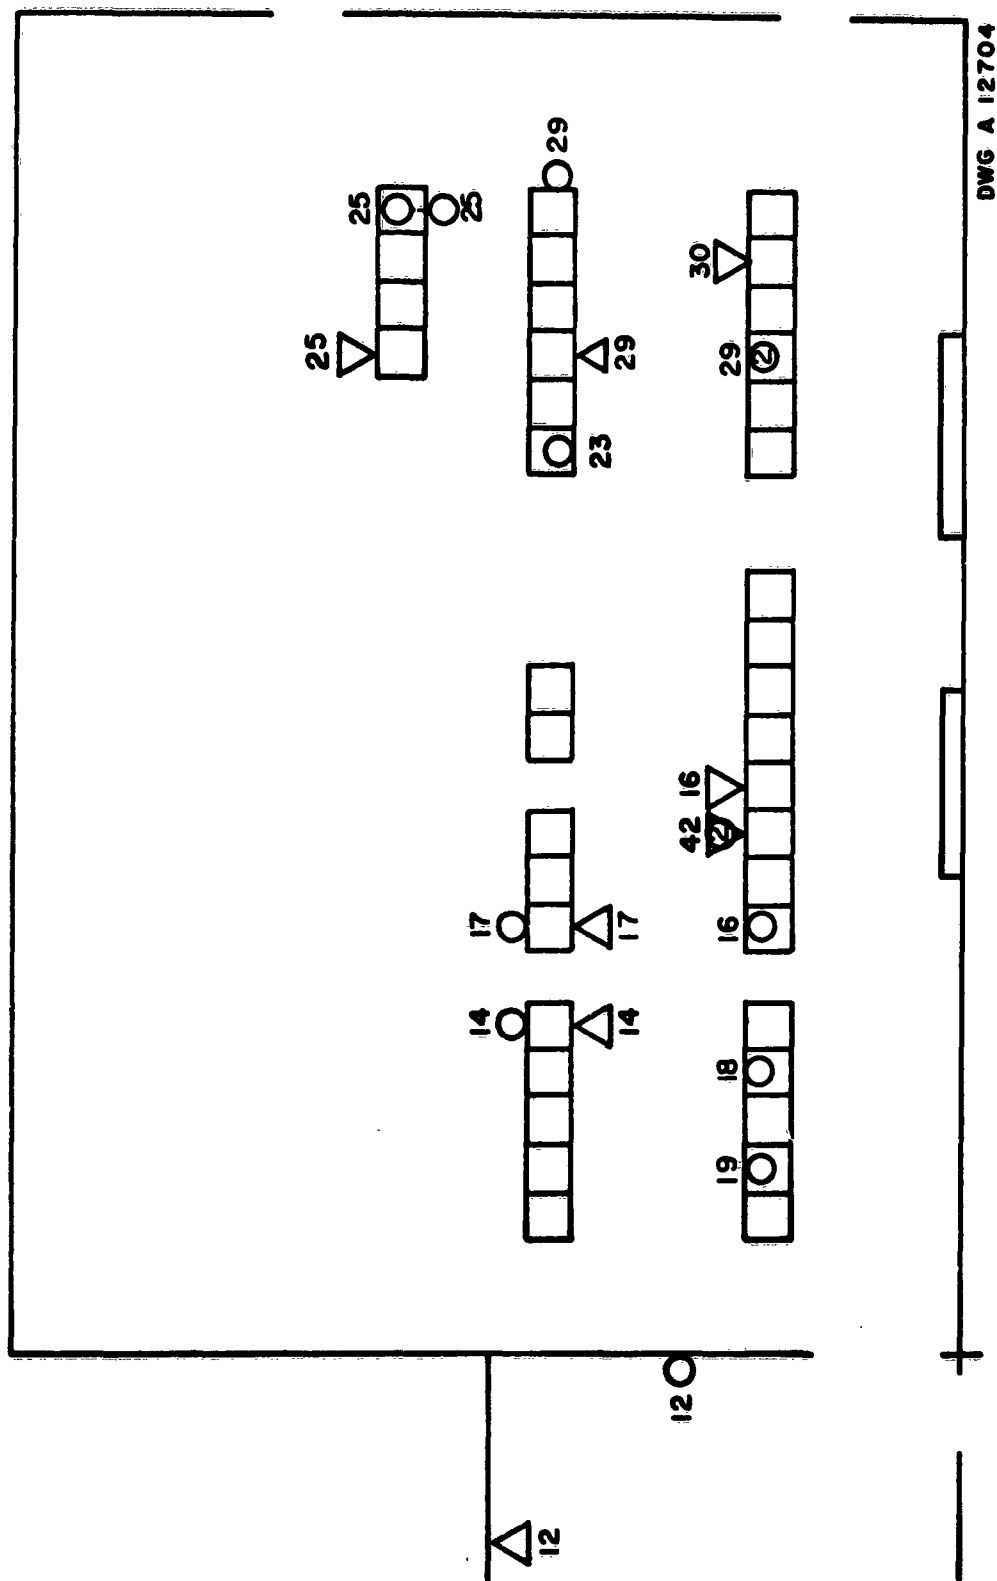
NHS Acquisition, Tracking, and Control Room #167 D.A.P. Building
